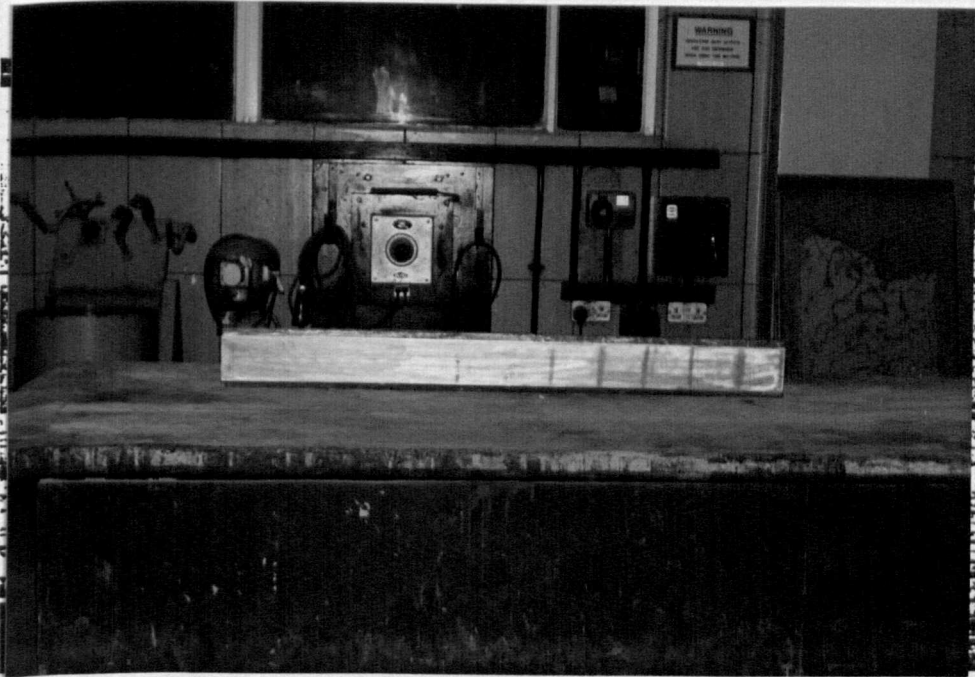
Fully Welded Beam (W-1000-F-1)
